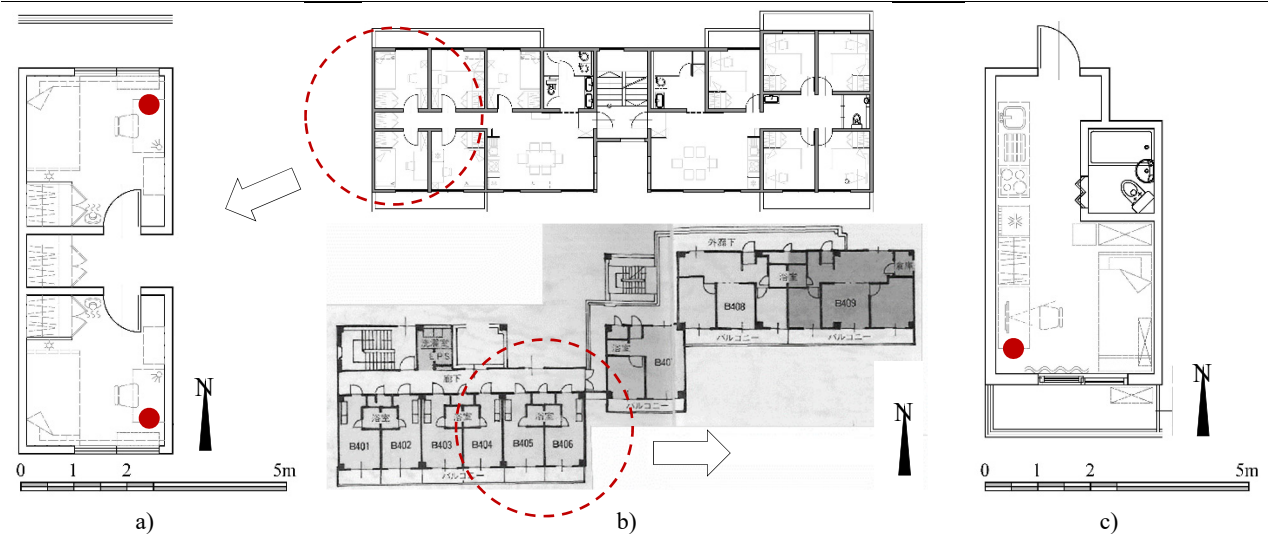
Dormitory rooms: a) Typical south and north facing room from GSD; b) Floor plans of GSD (up) and Kaikan (down); c) Typical room from Kaikan
